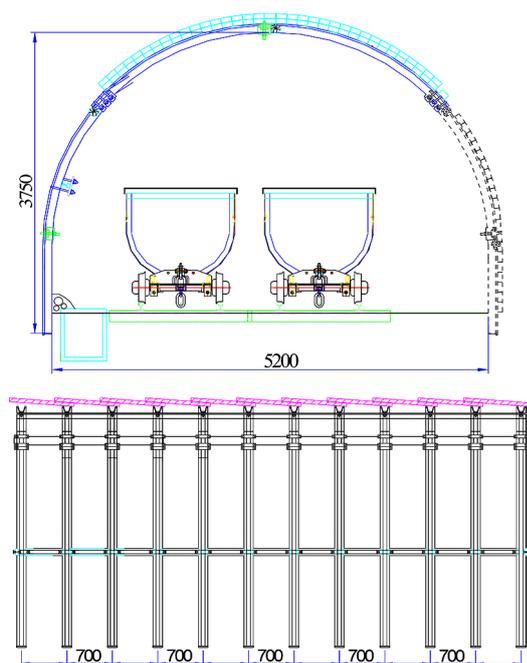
SVP-27 steel arch support passport with steel arch distance 0.7 m (two-lane railway roadway)
